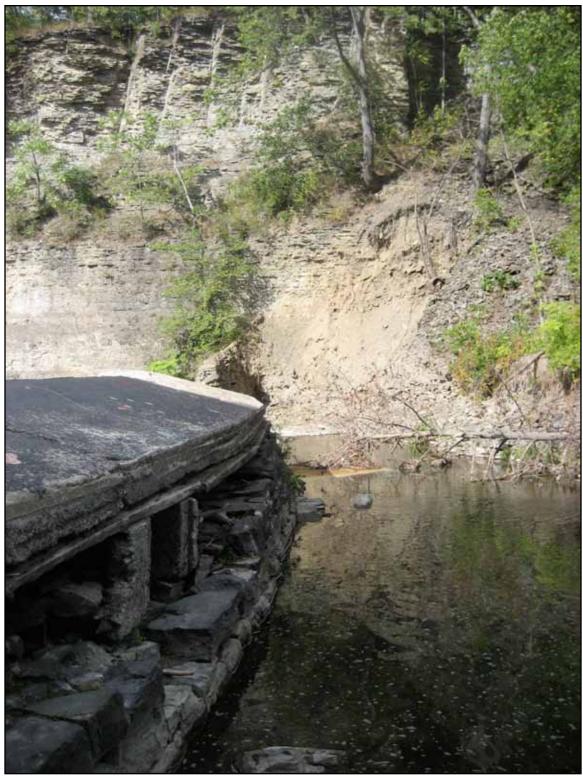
Upstream side of the dam, where the concrete shell has deteriorated, showing the crumbling stone foundation and the opening of the spillway. (Photograph by author).
